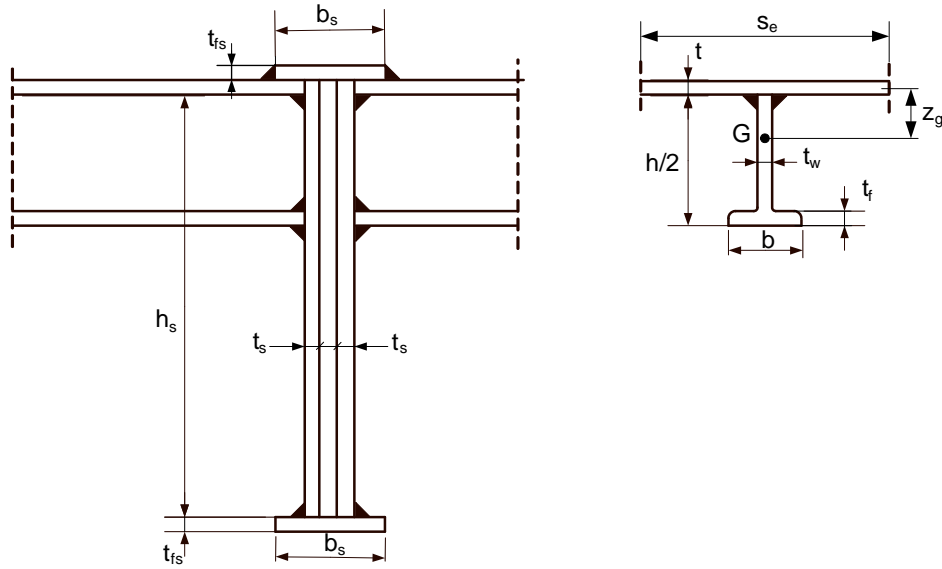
Radial beam of box section and the connected stiffened sectorial plates
